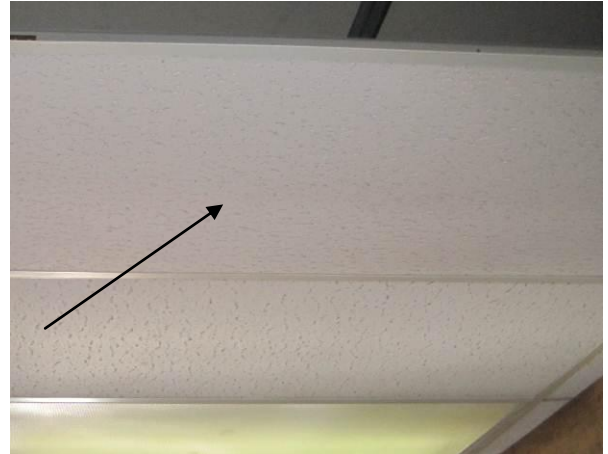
Asbestos-containing 2' x 4' Ceiling Tile (White, Pinholes, Lengthwise Fissures).
